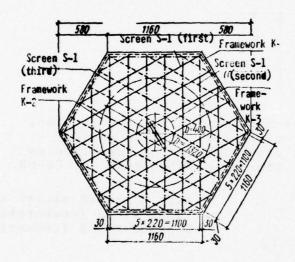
Hexagonal road slabs of the brand DSSH-2.
